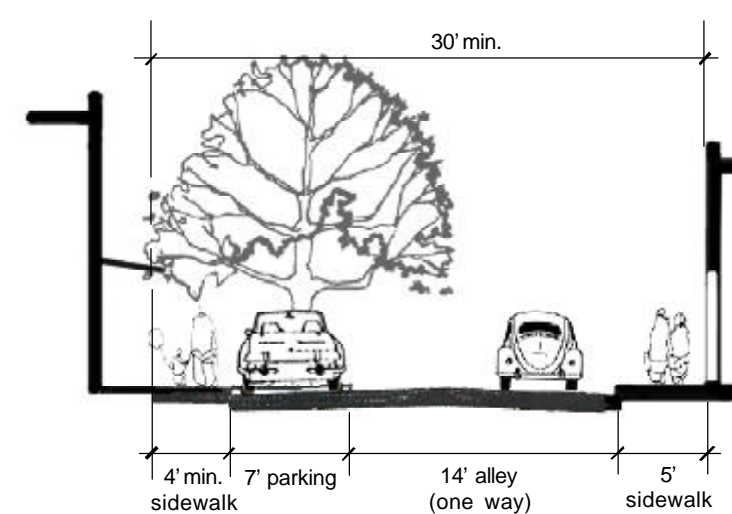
Road Section L -- One-Way Alley w/ Parking One Side
